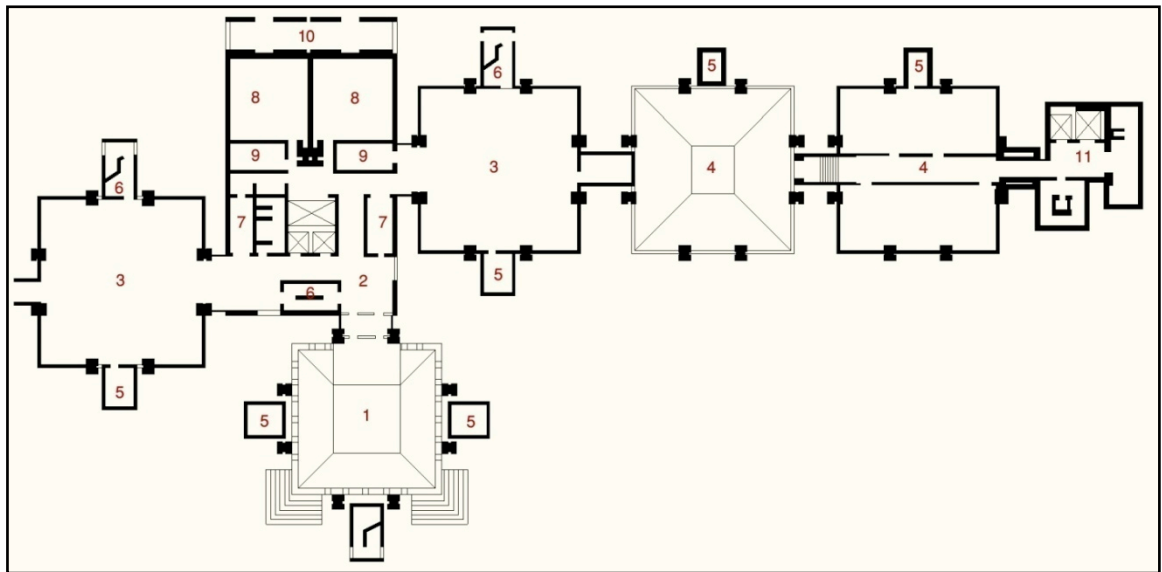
Richard Medical Building, Ground Floor Plan (Re-drawn by Author)
